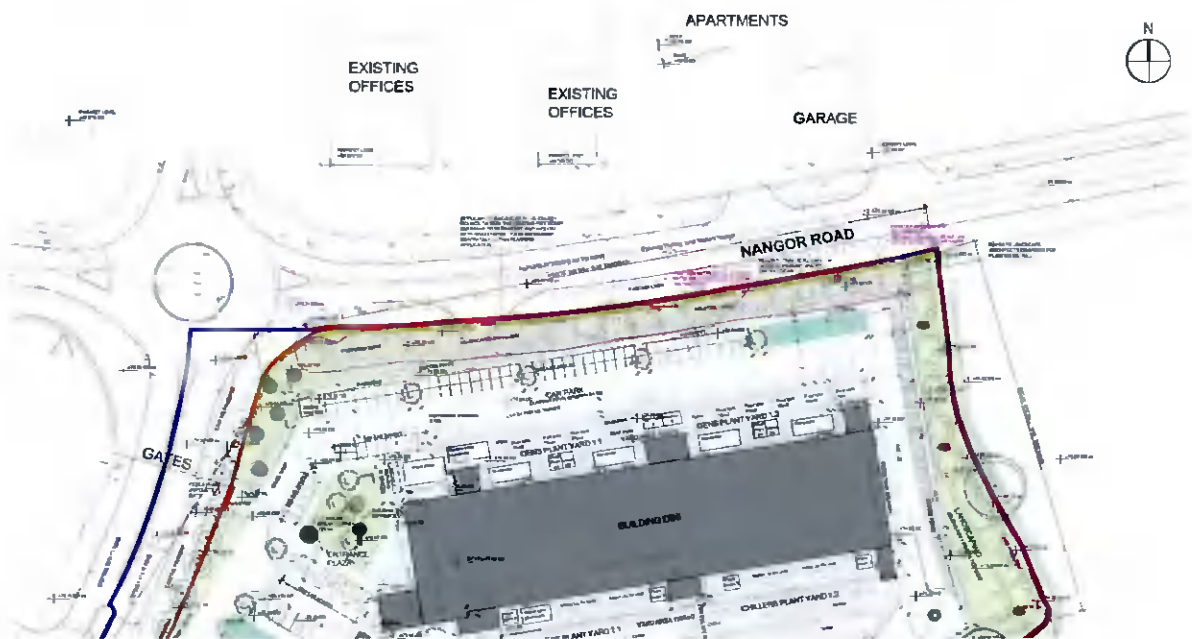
Extract from the Revised Site Layout Plan with generous setbacks from Nangor Road
